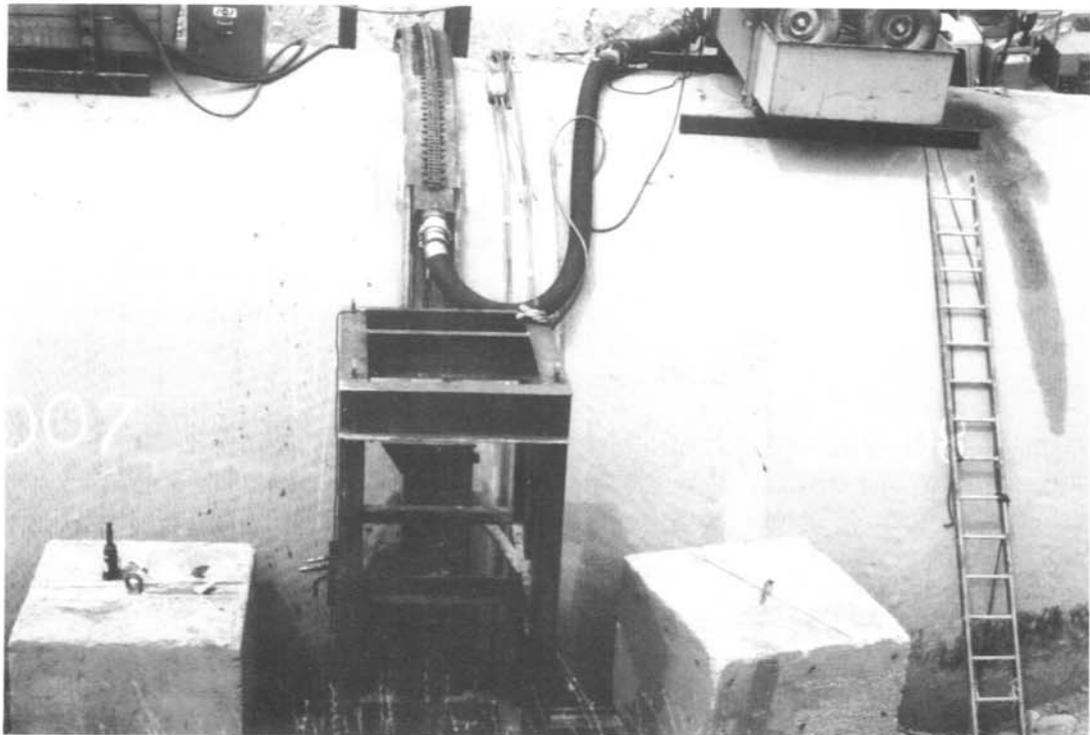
When pipe was repaired in service, tendons were installed over mortar coating and corroded and broken prestressing wire through the narrow annulus beneath springline.
